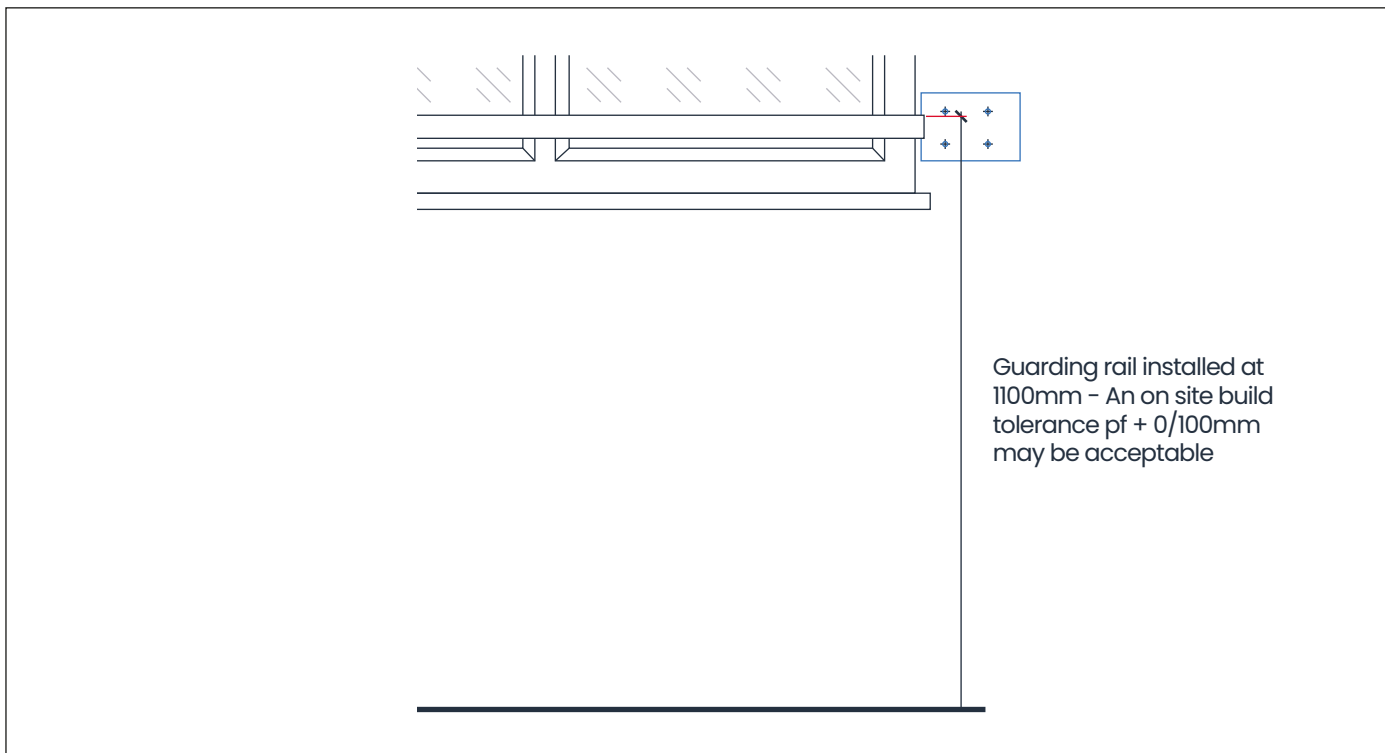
Example of how build tolerance may be shown on plan for overheating windows also used for means of escape.
